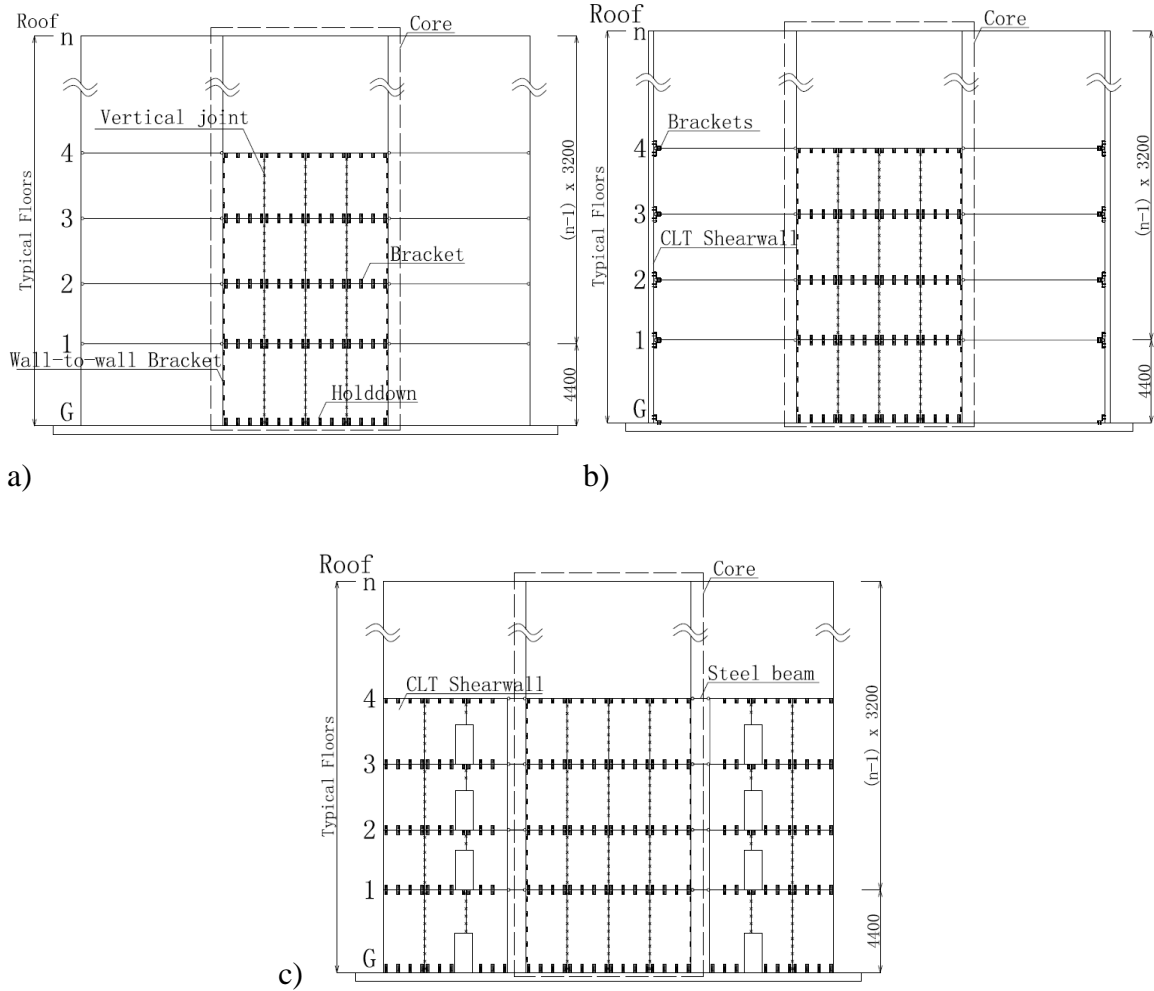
Designed connection system for the wood buildings: a) 10-storey; b) 15-storey; c) 20-storey.
